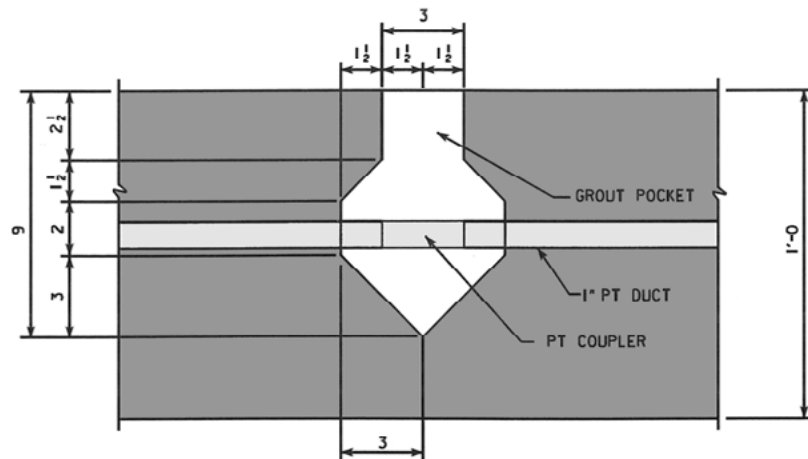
Illustration. Keyway dimensions for the longitudinal joint (dimensions in inches). (Note: 1 in. = 25.4 mm)
